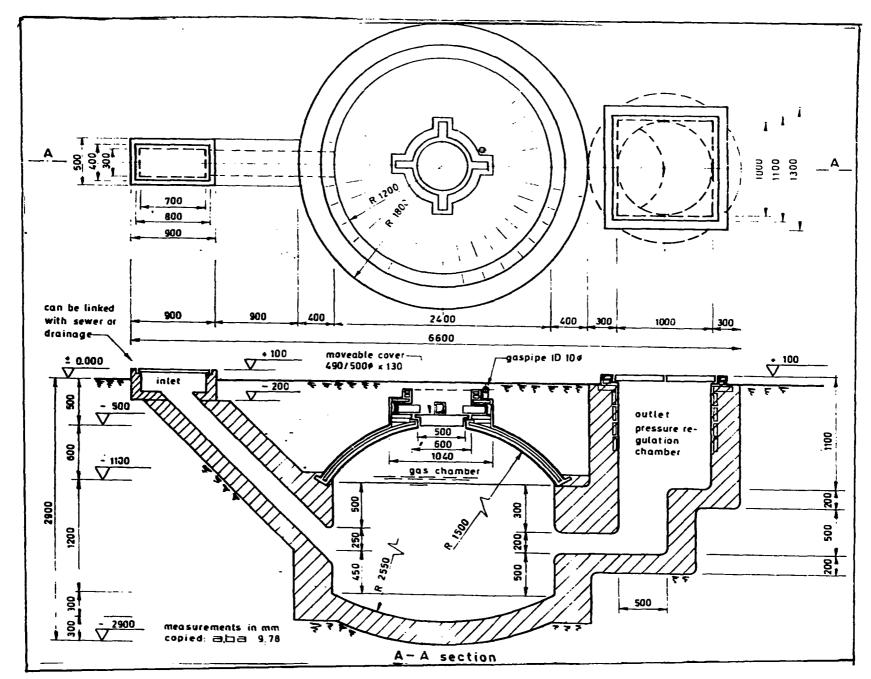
Design of an Excavated Biogas Unit with Masonry-Built Tank
